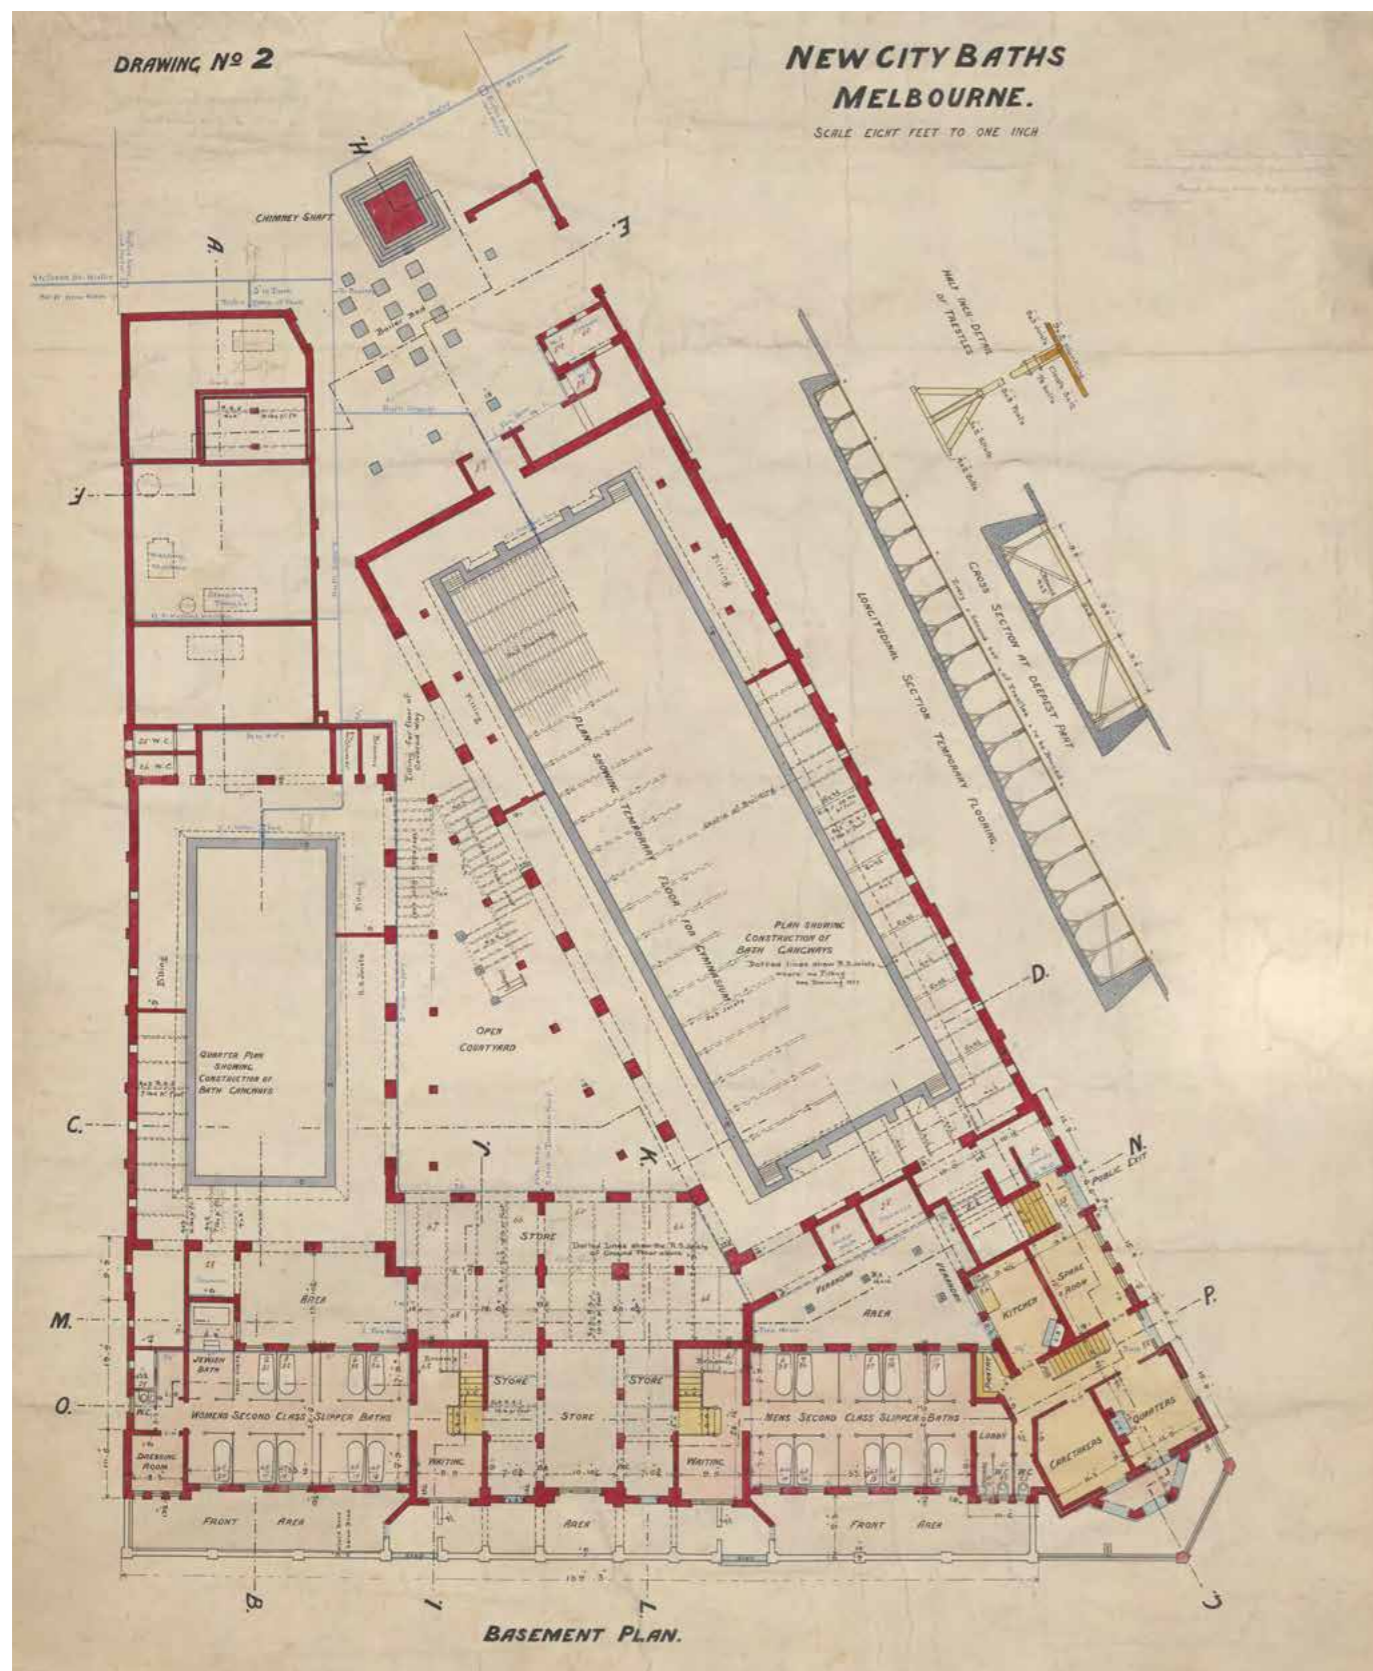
Drawing no. 2, Basement Plan, New City Baths Melbourne, 1904
